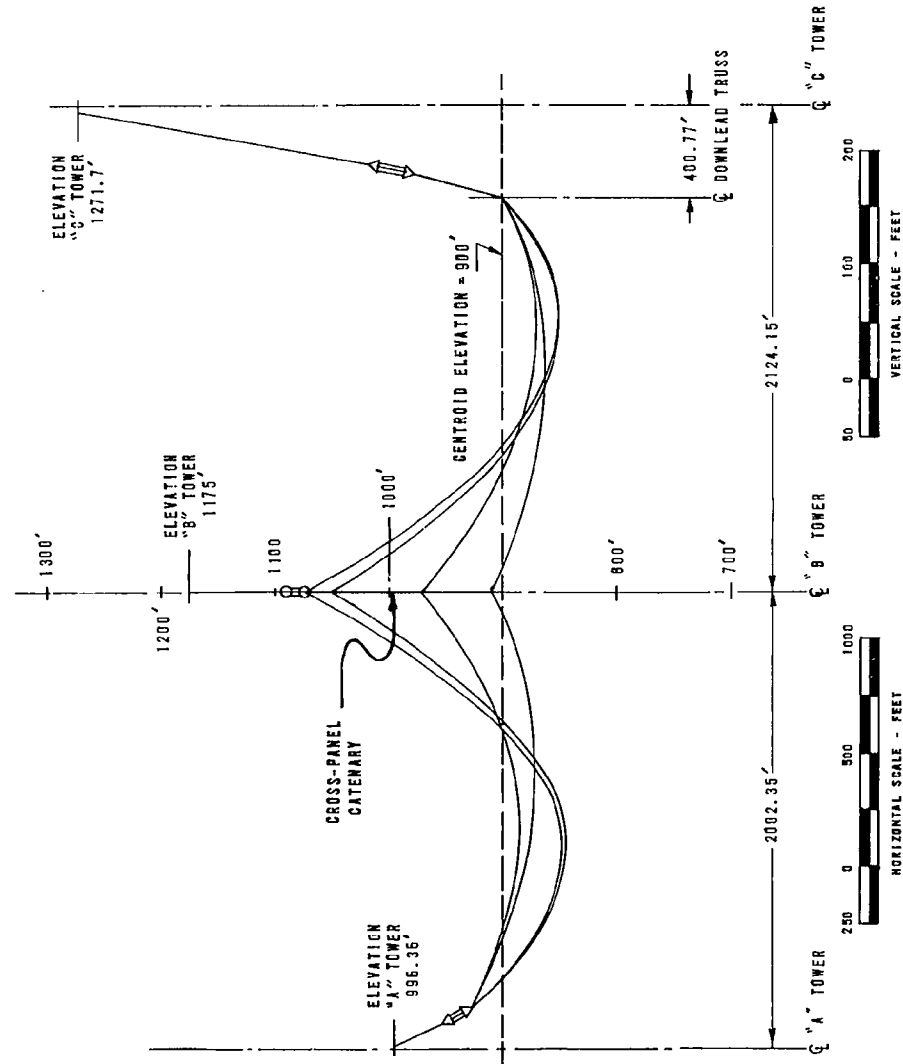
ELEVATION VIEW OF LONGITUDINAL PANEL CROSS SECTION - TOP HAT I
